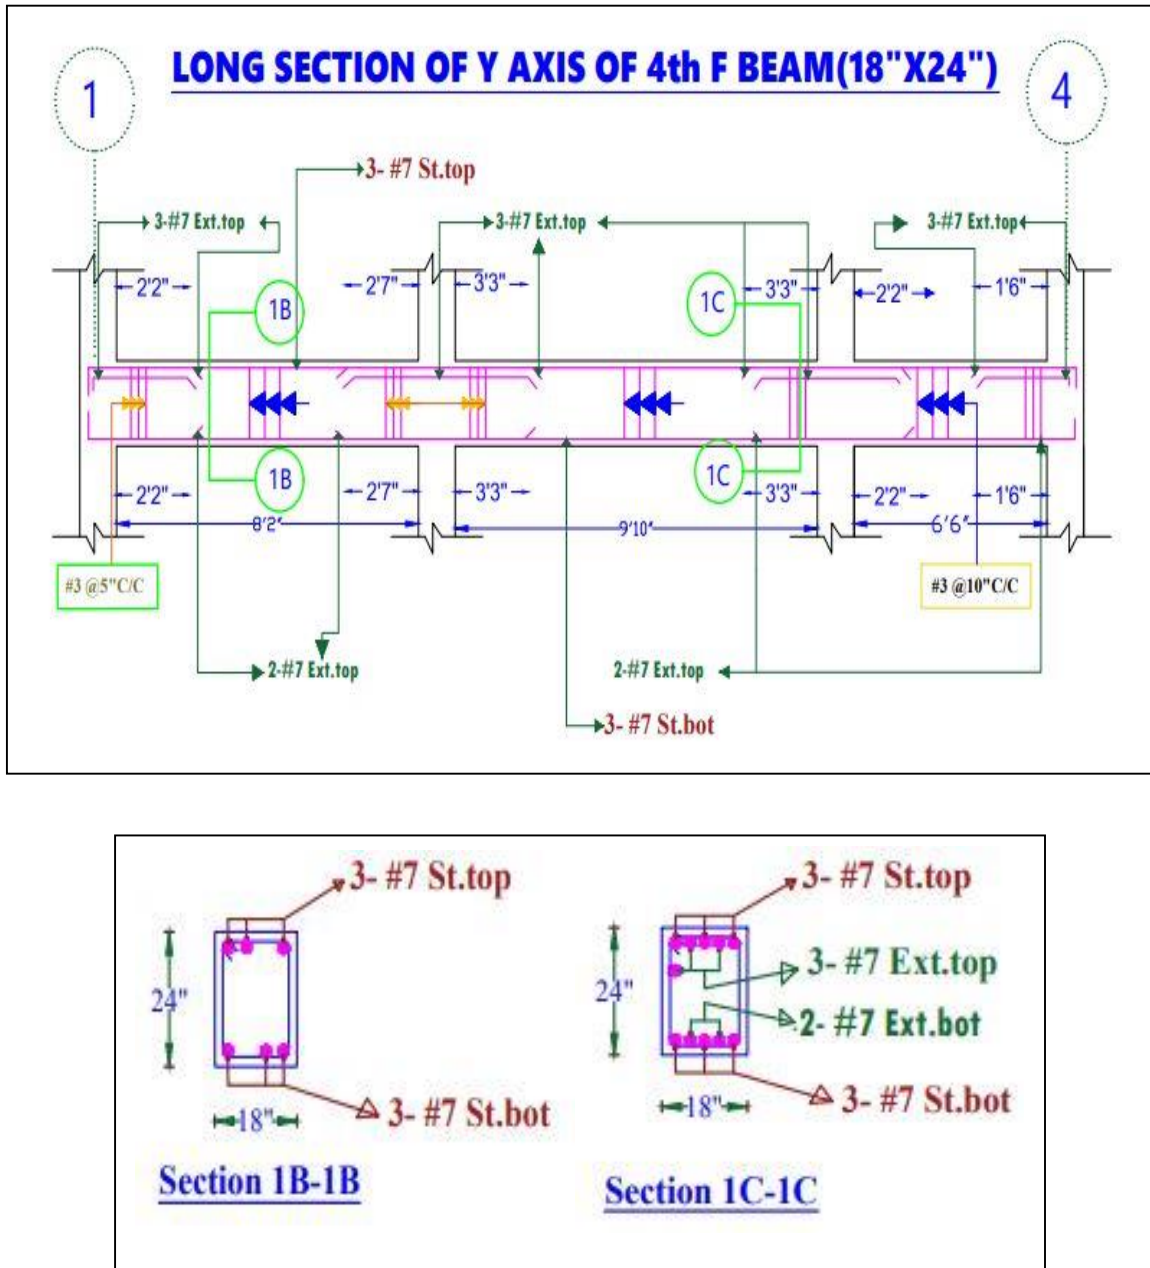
Beam Detailing & Cross Section of Y-axis
